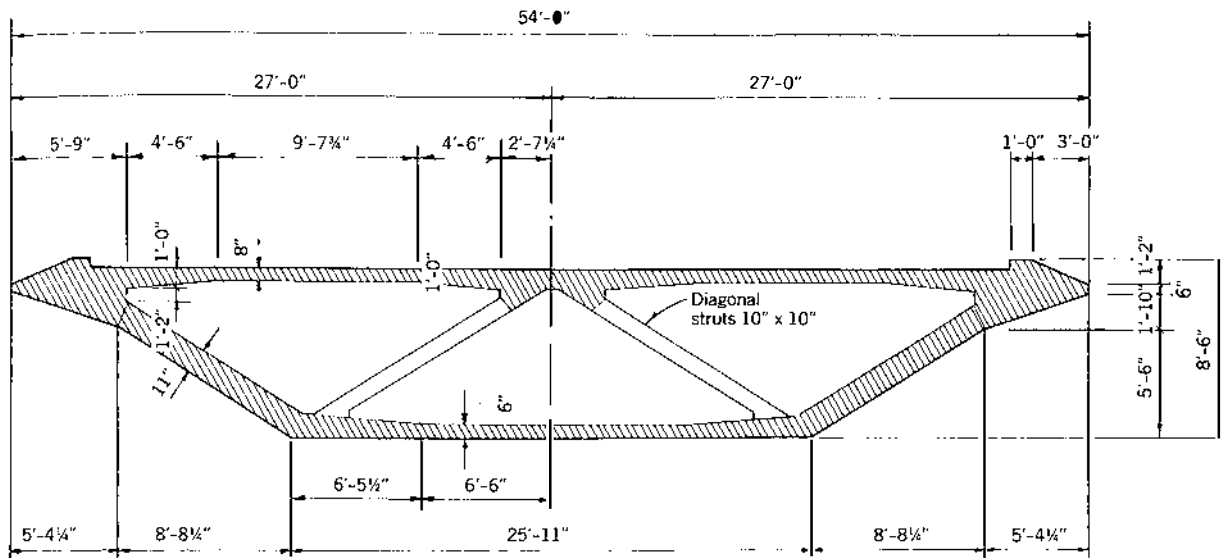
Ruck-A-Chucky Bridge, cross section of concrete box girder alternate, from reference 24.
